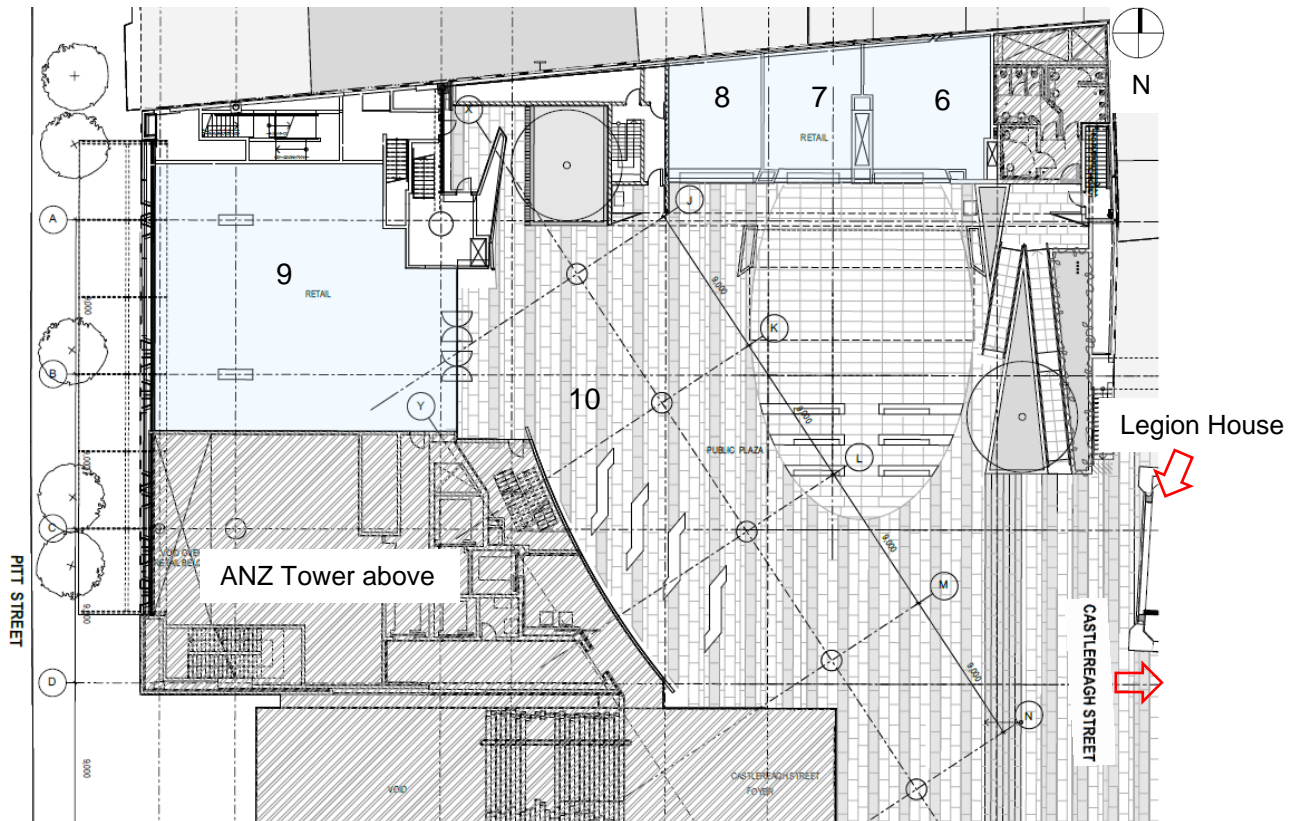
Existing ground floor plan of the plaza showing the existing tenancies.
